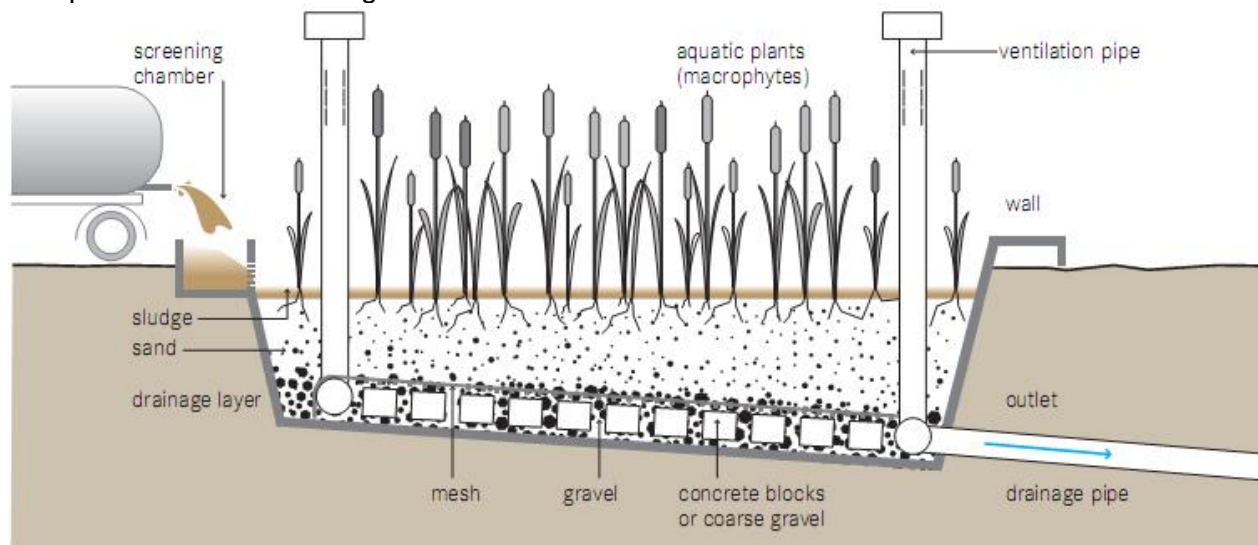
Planted drying beds (EAWAG & WSCC 2008)
